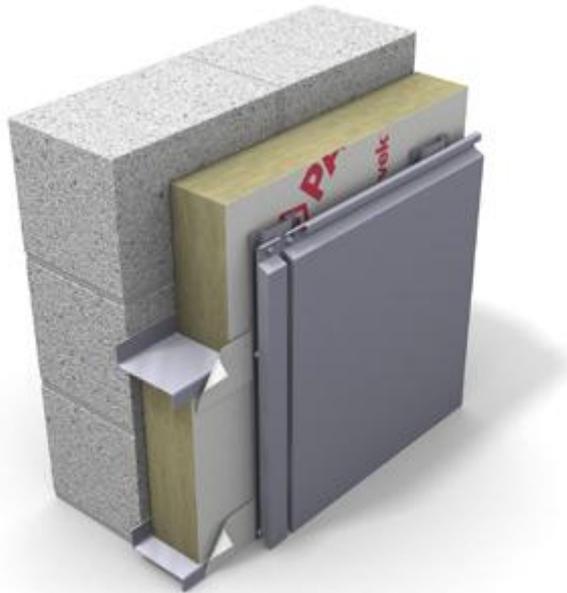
Rendered massive brick or block wall, with additional thermal insulation and panel cladding.
